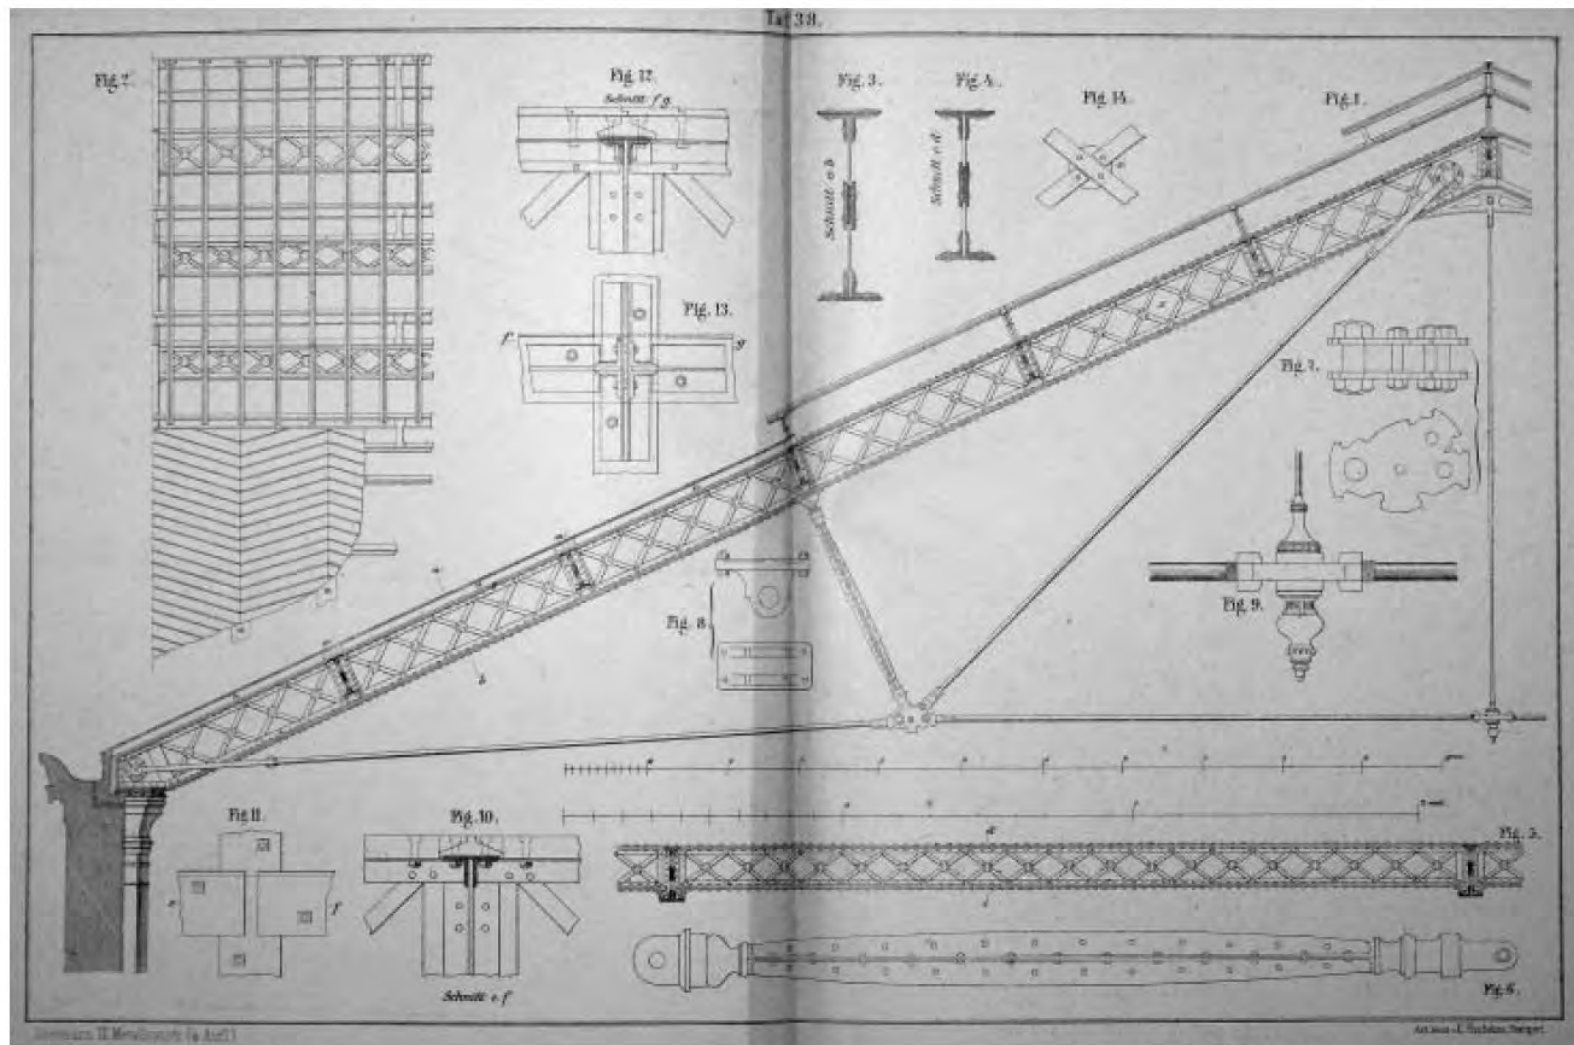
Lyon-Perrache, roof of the railway station (completed in 1855). From Breymann 1877, plate 38.
